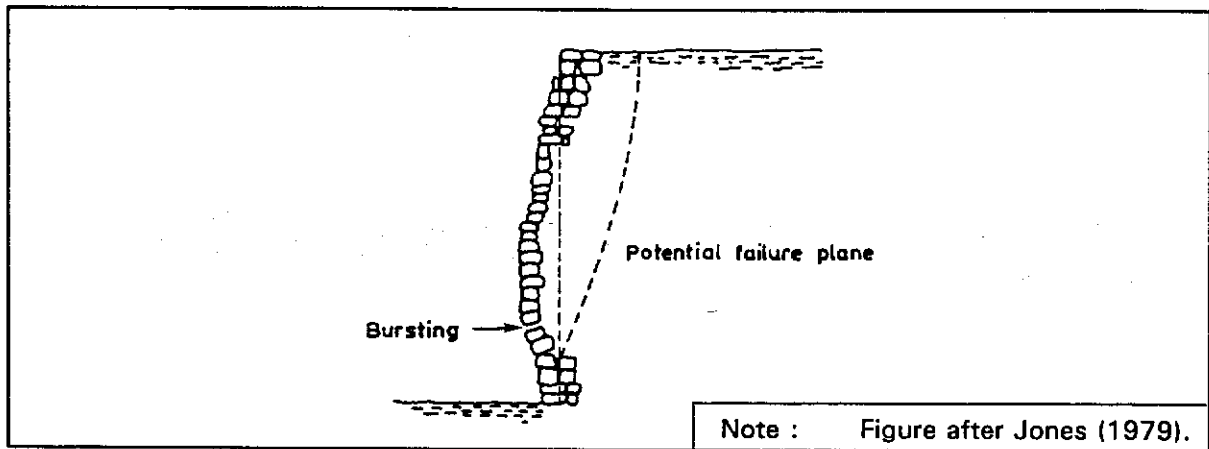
Mode of Failure of Victorian Stone Retaining Walls
